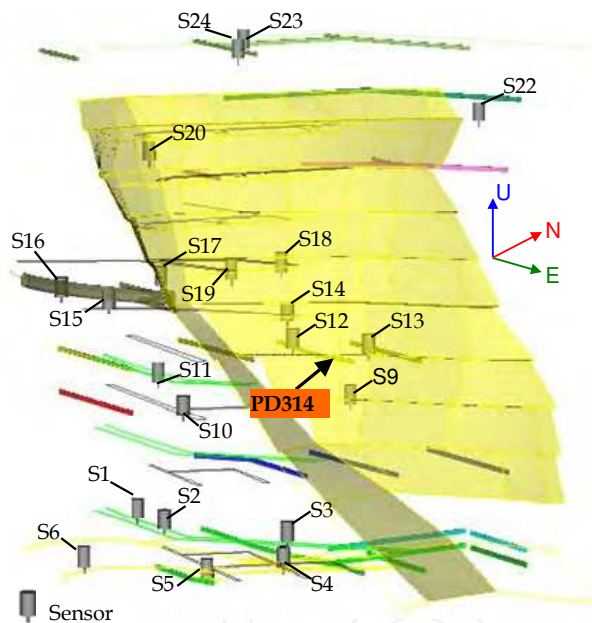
Spatial arrangement diagram of sensors at eleven elevations.(Noting that three sensors No.7, 8, 21 to be installed later on due to the limitation of tunnel condition. The different color columns present different tunnels such as transportation tunnels, drainage tunnels, and exploratory headings).
